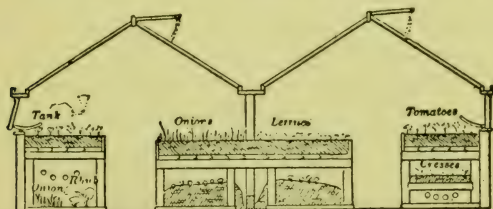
SMALL GREENHOUSE—CROSS SECTION
